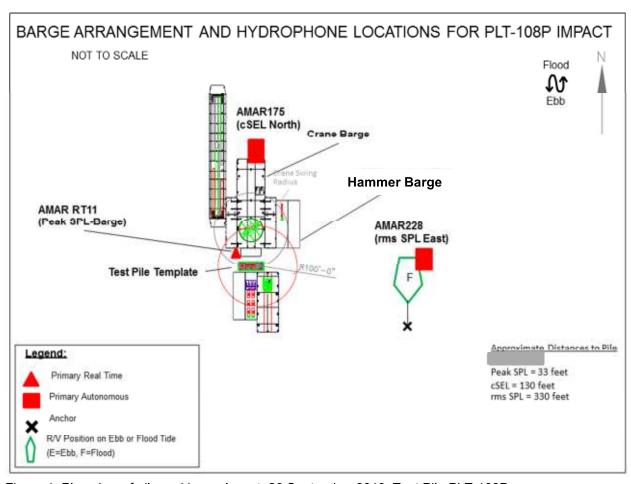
Plan view of pile and barge layout, 26 September 2013, Test Pile PLT-108P.
